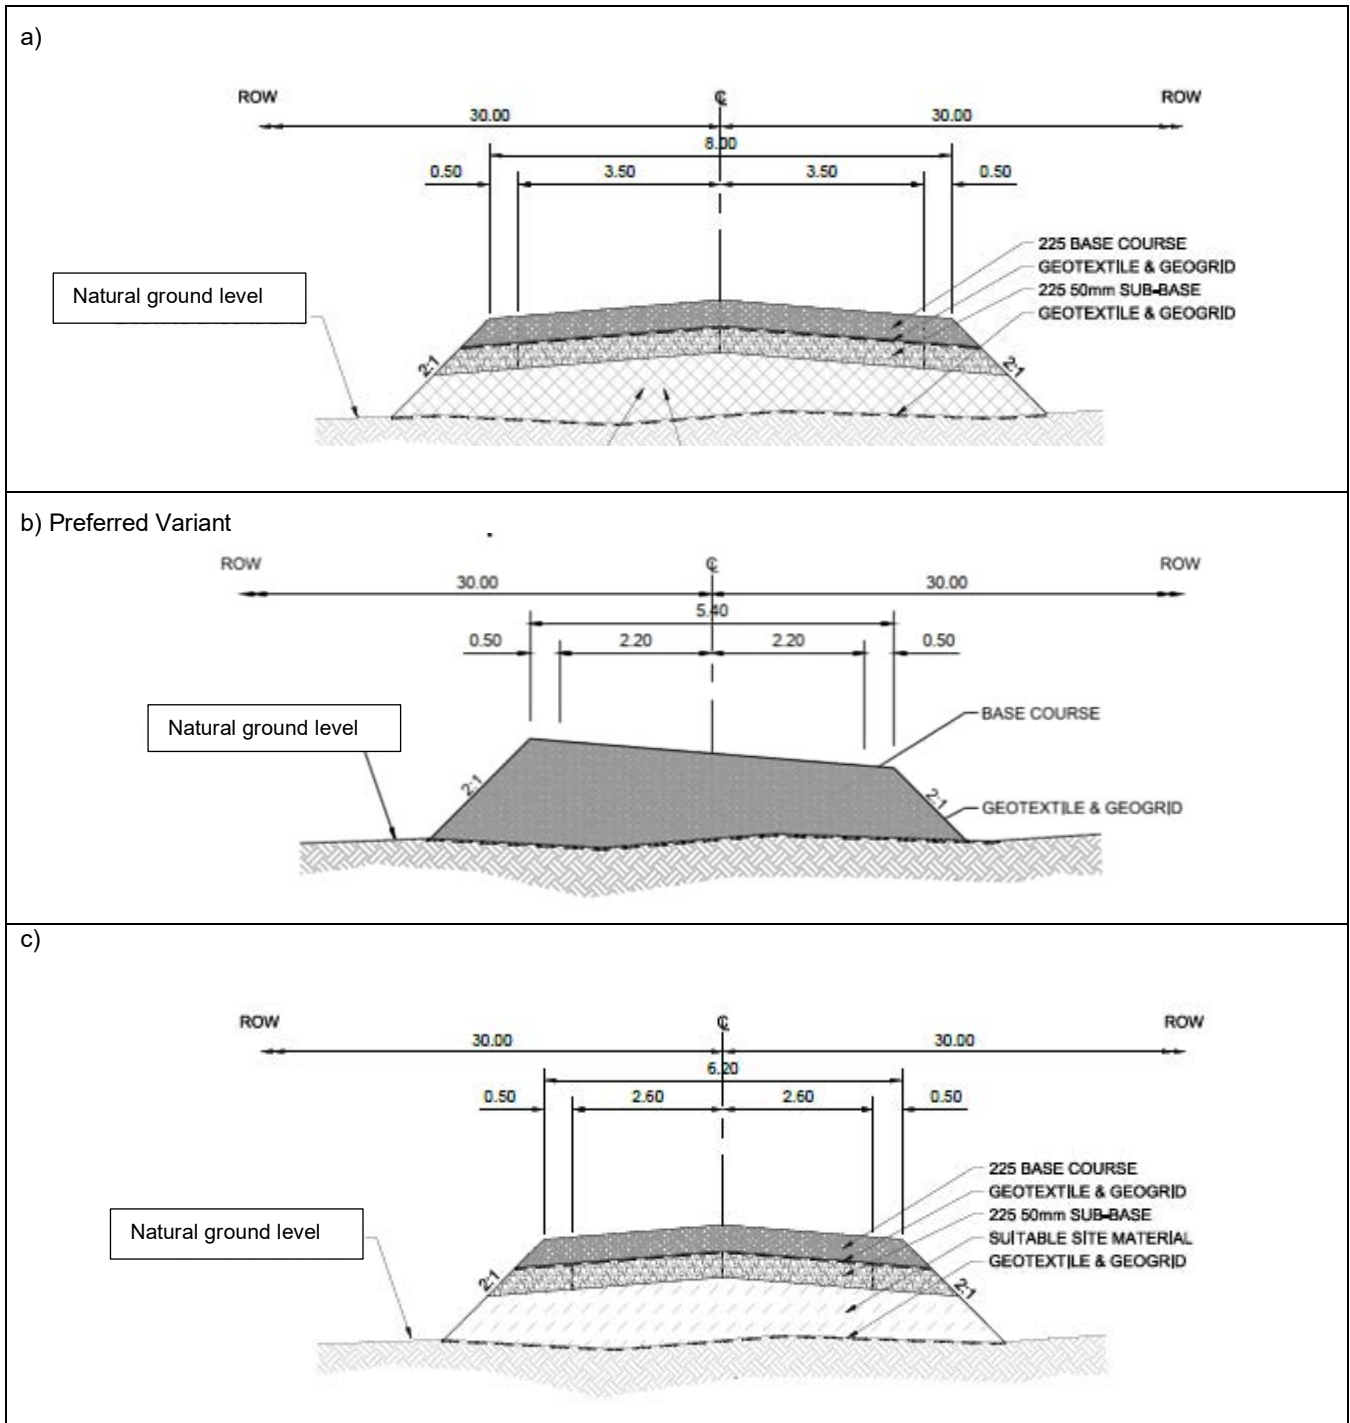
Typical sections of the access road a) one-lane seasonal (8 m section) b) one-lane two-way temporary gravel road (5.4 m width); c) winter road (6.2 m section)
